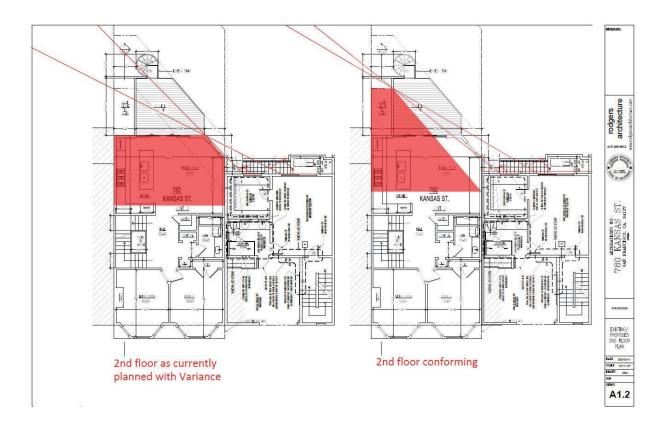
Proposed Second Floor Plan and Code Compliant Configuration with Sightlines From 778 Kansas
